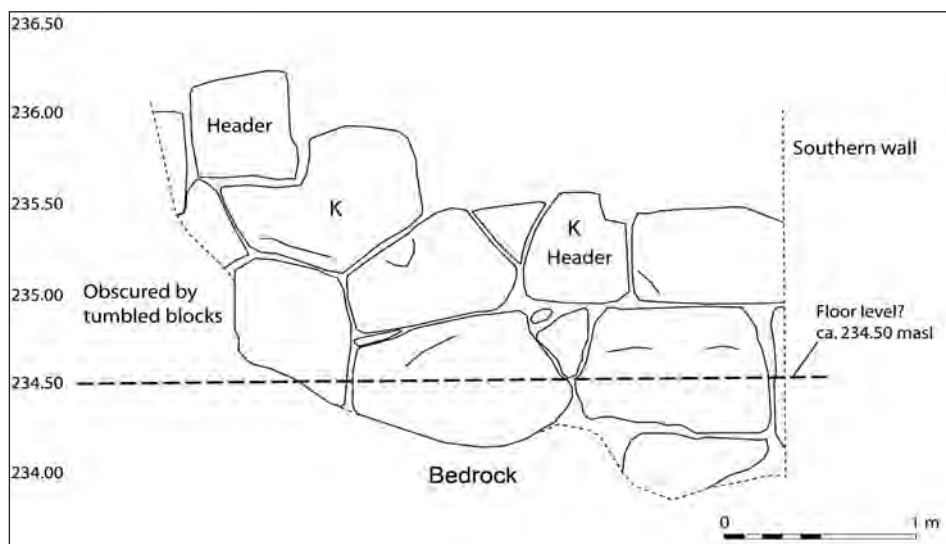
Eastern wall with the assumed original floor level at 234.50 masl. Header blocks and keyed blocks (K) are also marked.
